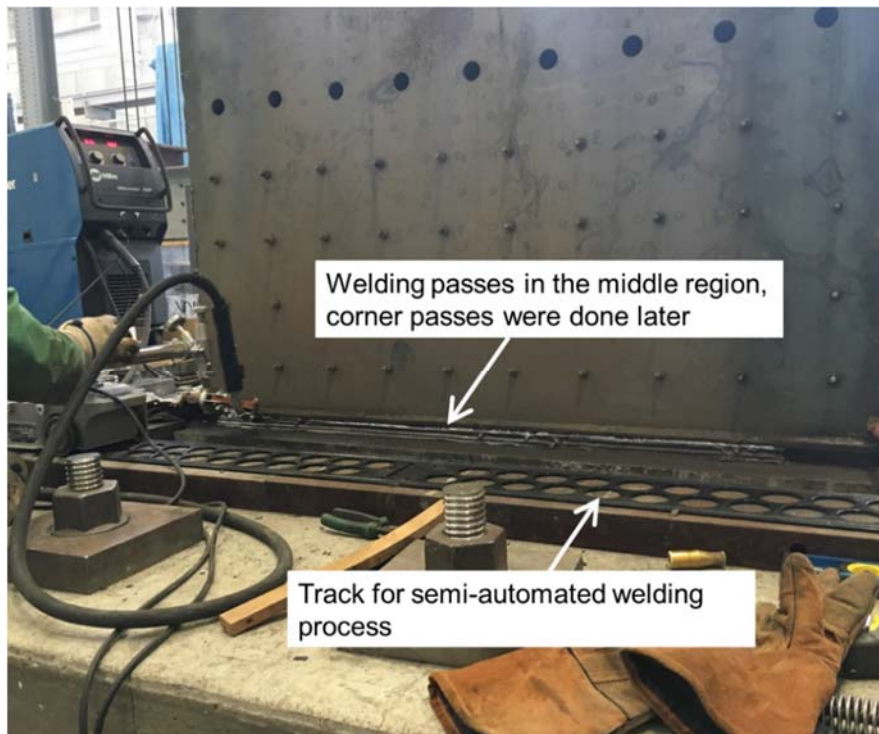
SC-WP-H: Faceplate-to-baseplate welding in progress
